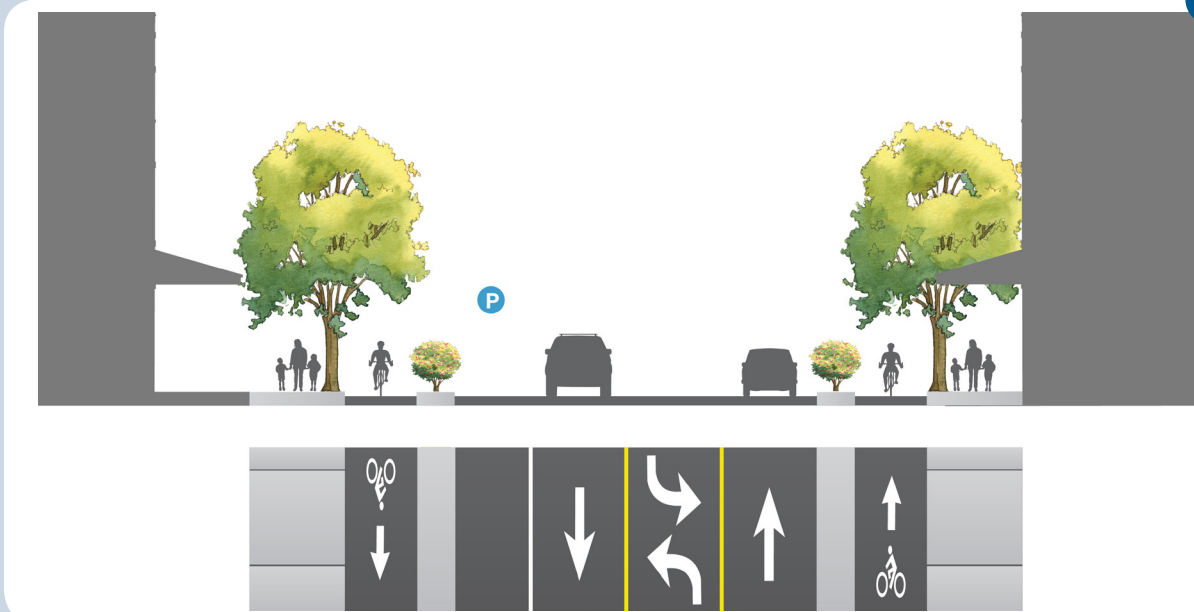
A Street (Between Main Street and Foothill Blvd) Proposed Improvements
